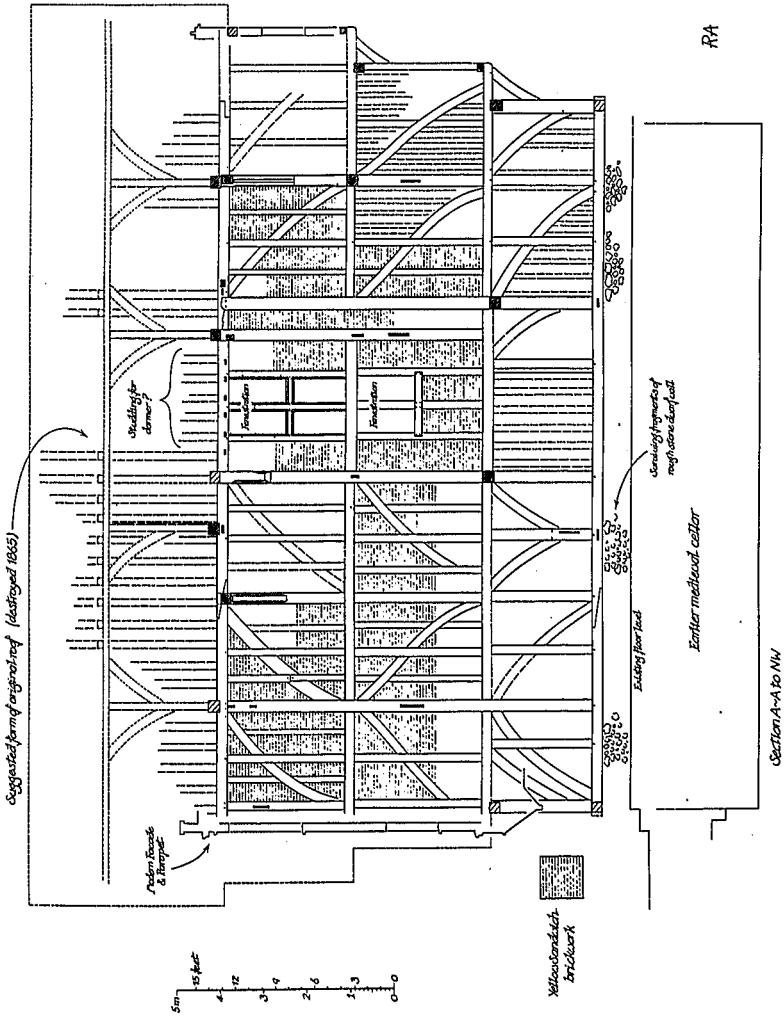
8 High Street, Canterbury; reconstructed longitudinal section through the building.
